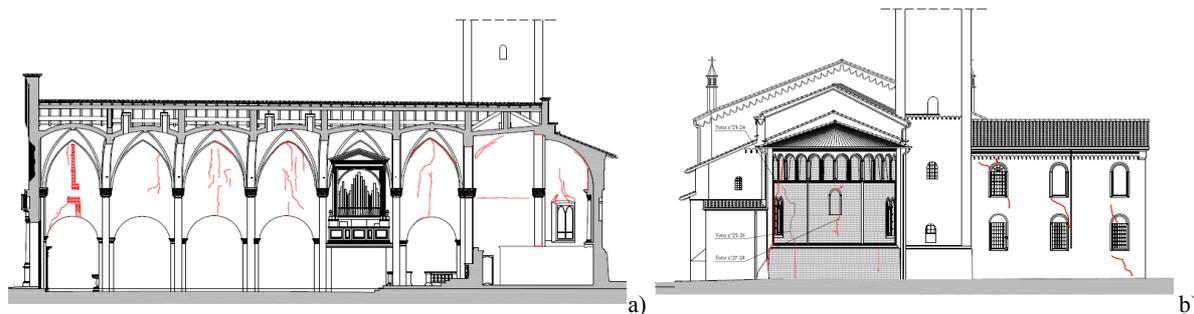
Crack pattern survey of St. Bassiano church: a) central nave longitudinal section and b) external view of the East side.
